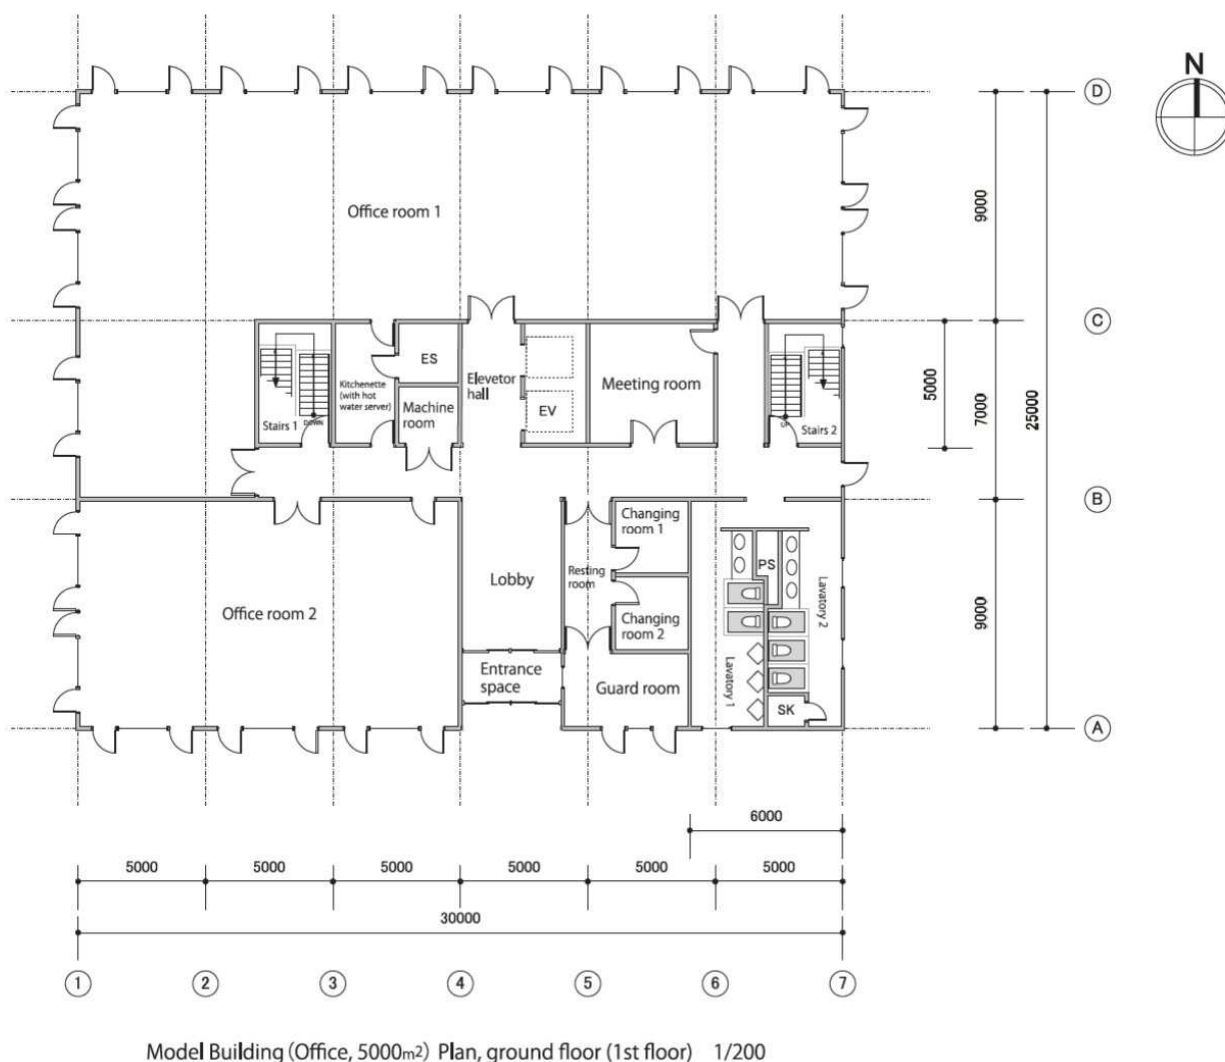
Model building (Office, 5 000 m²) plan, ground floor (first floor) 1/200
